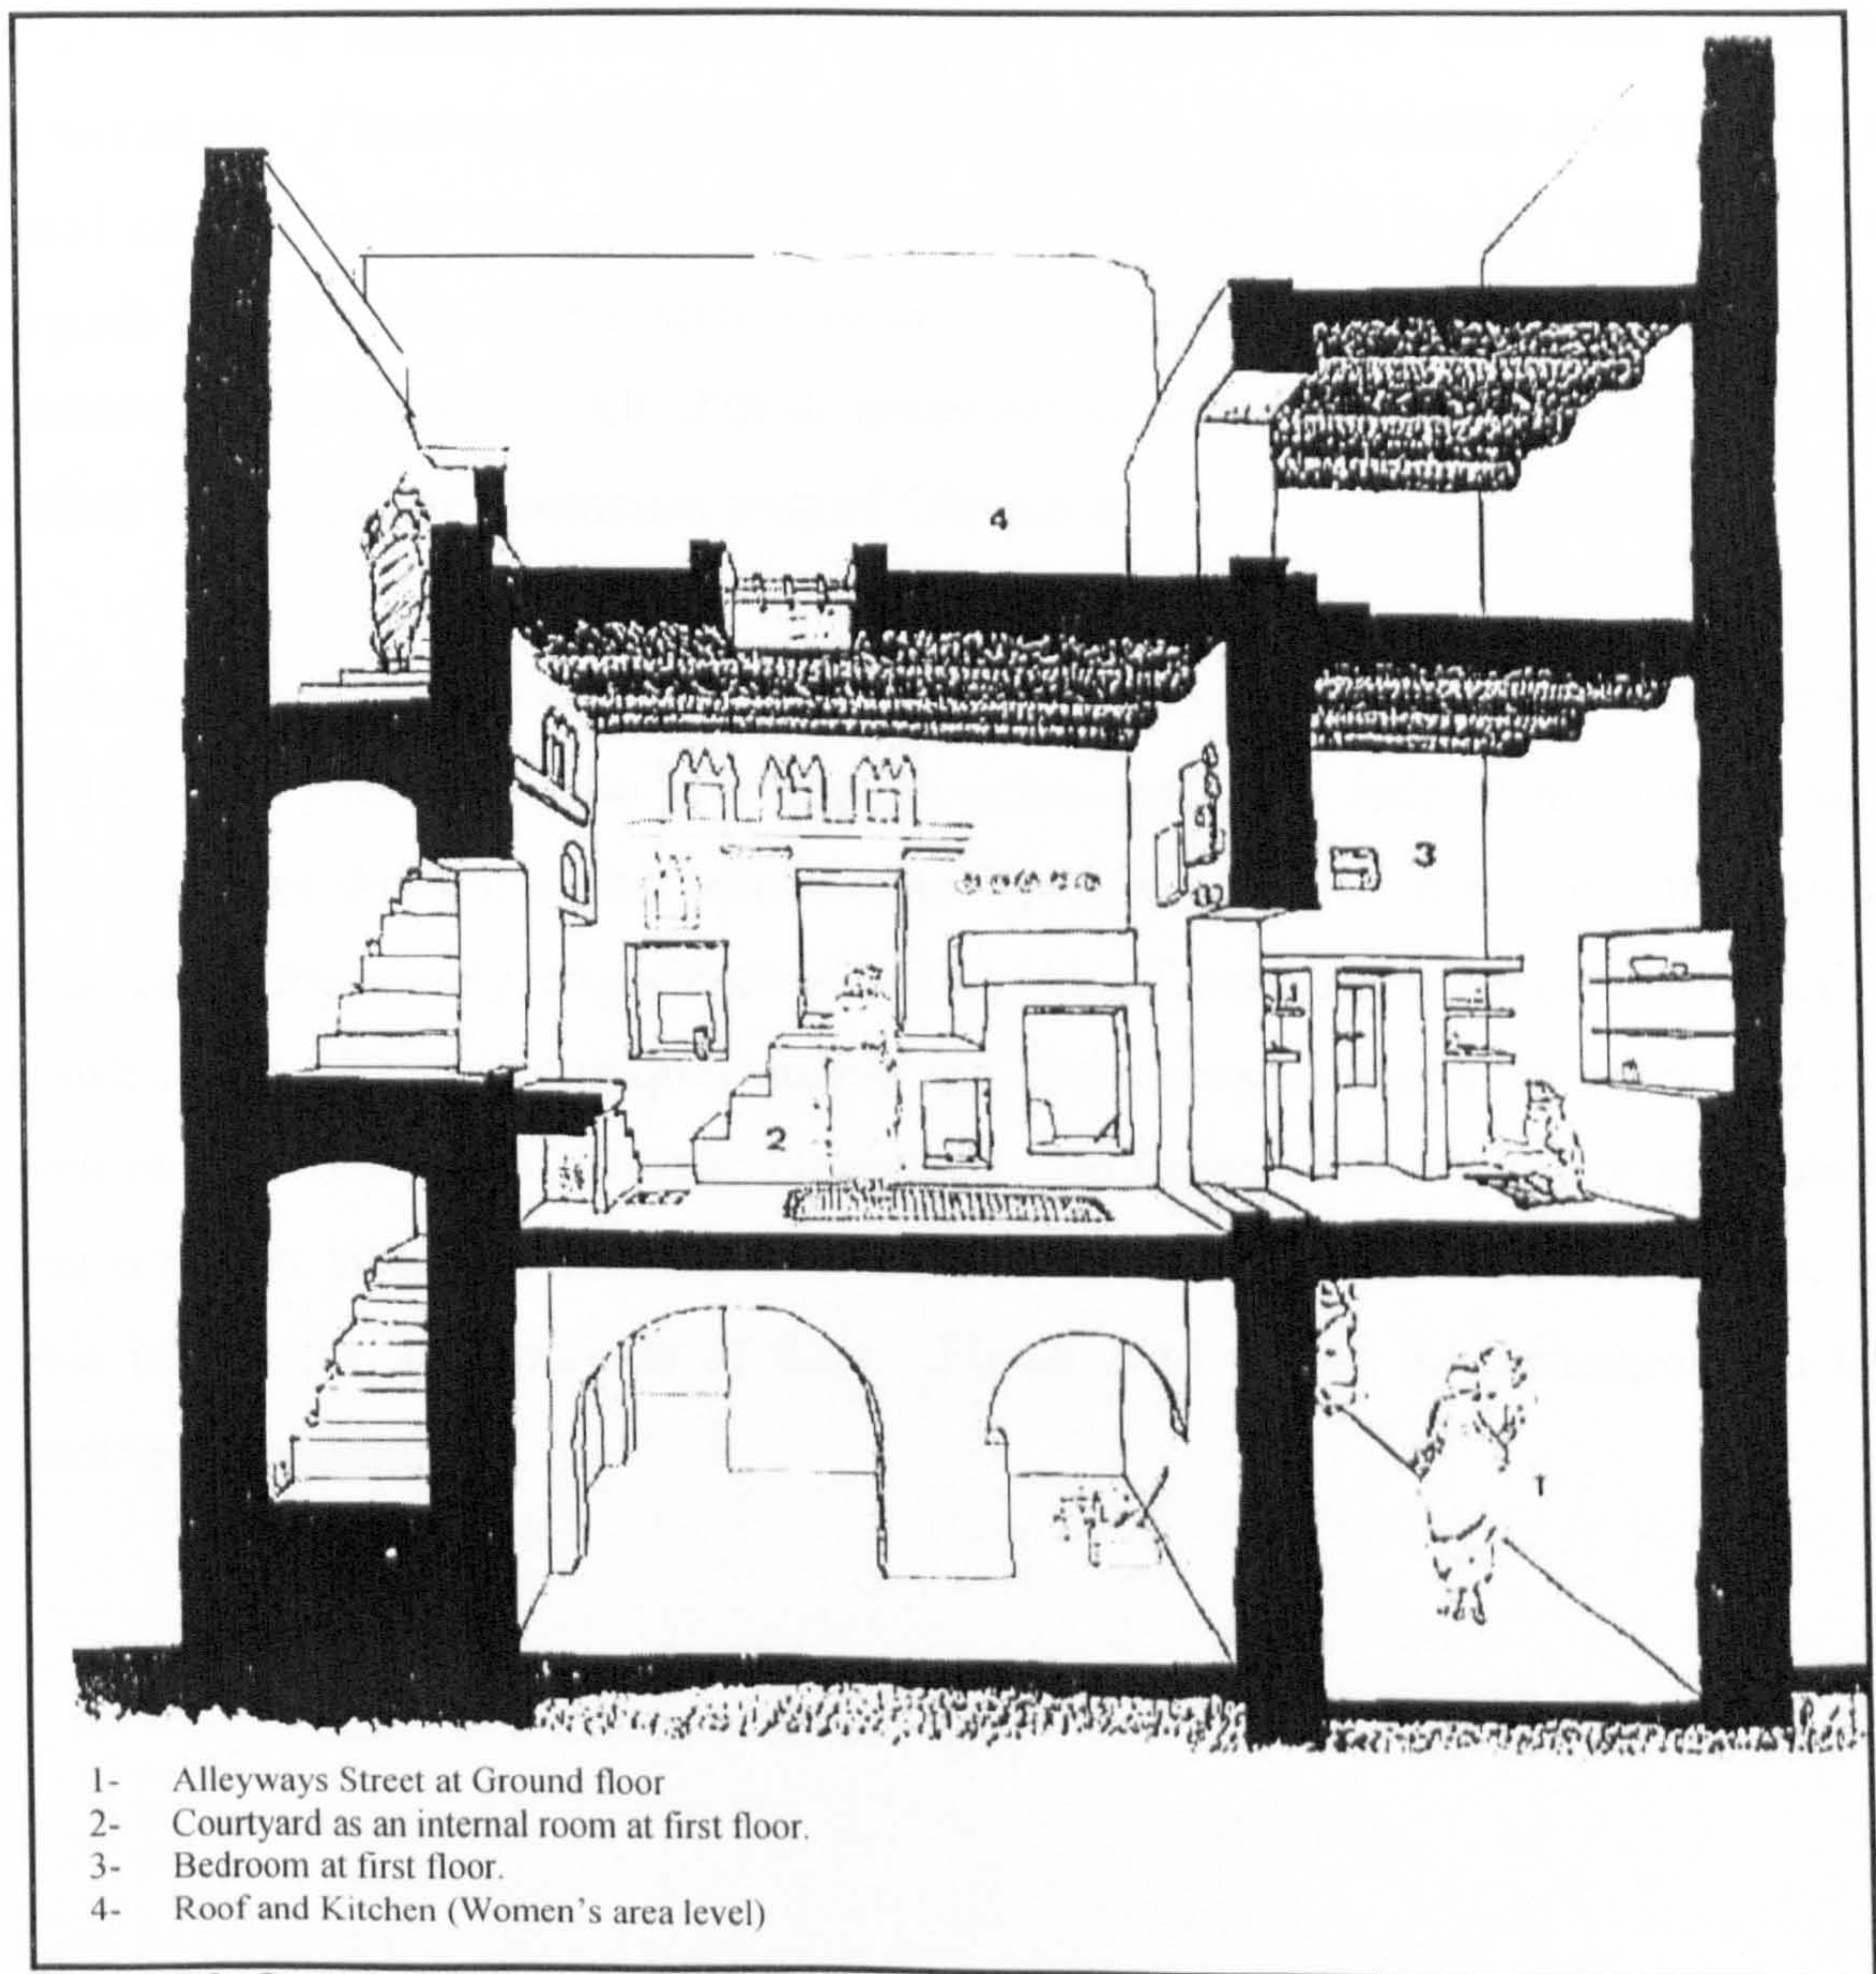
Sectional Perspective a through Traditional Building in the Old Town of Ghadames.
